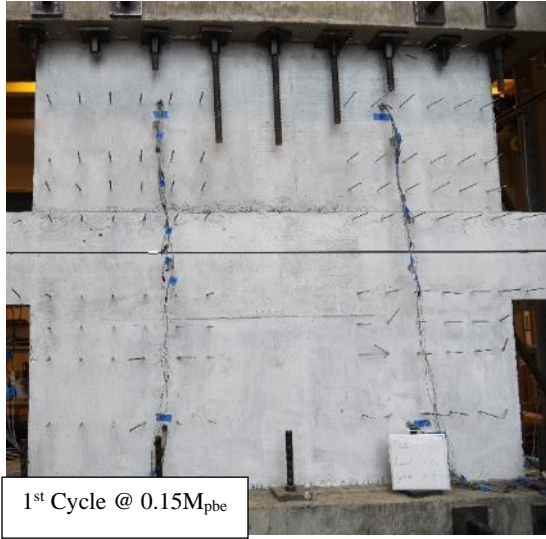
Wall Damage Photos for SRC-W1
